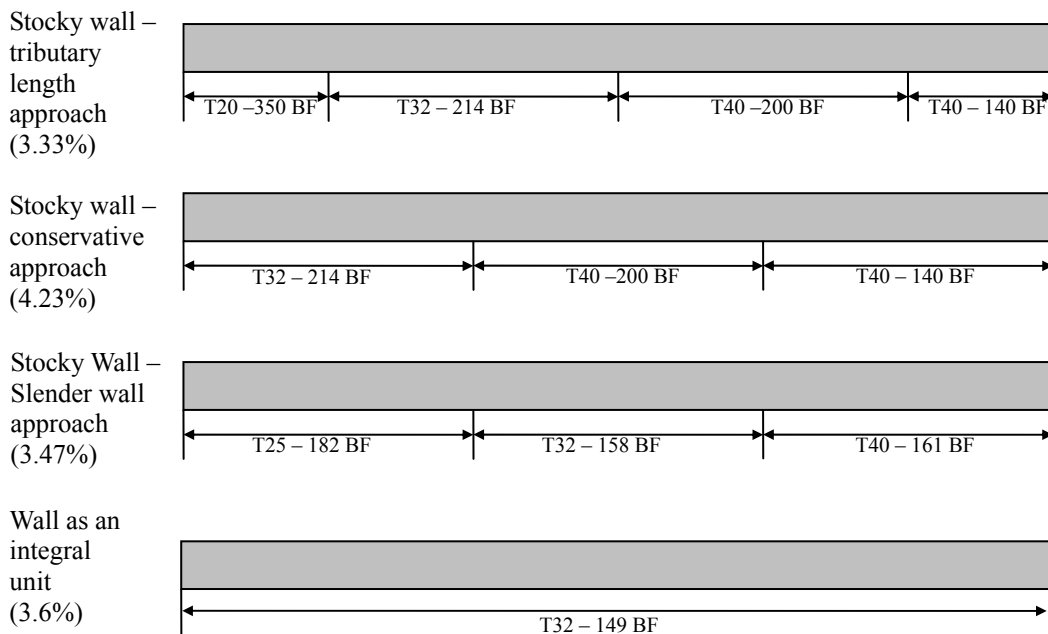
Summary of reinforcement details of Worked Example 7.2
